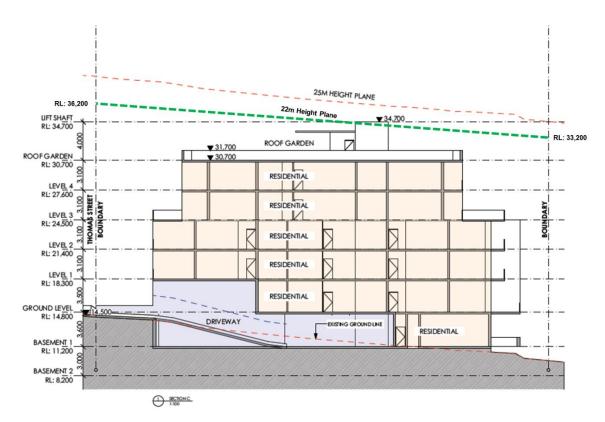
Section facing north from Parramatta River with adjacent properties (Source: PTI Architecture)
